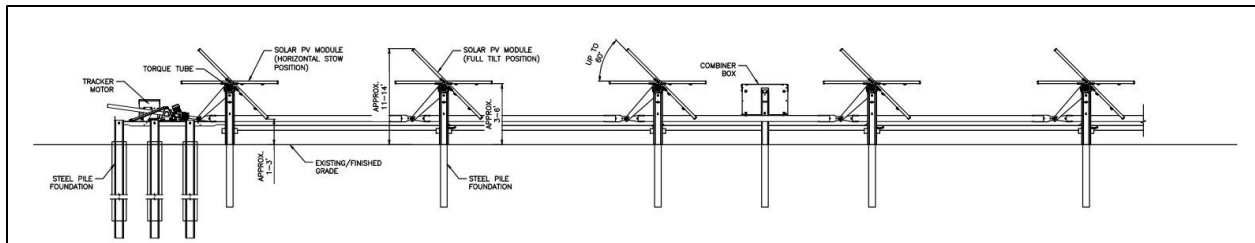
Single-Axis Tracker Solar PV Typical Elevation View
